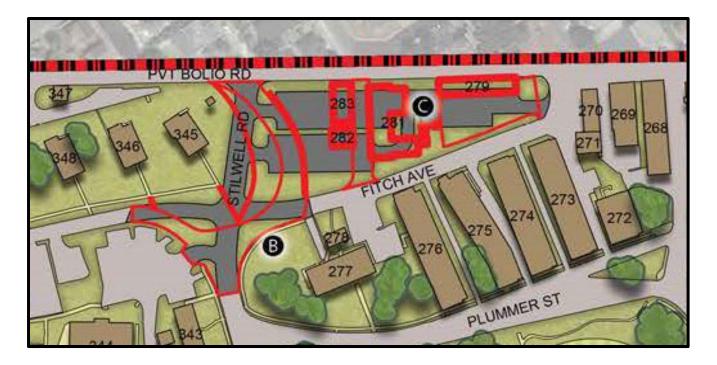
Planning map above depicts proposed parking lot and street layout in dark grey. Red lines depict the footprint of the demolished buildings and pavement.
